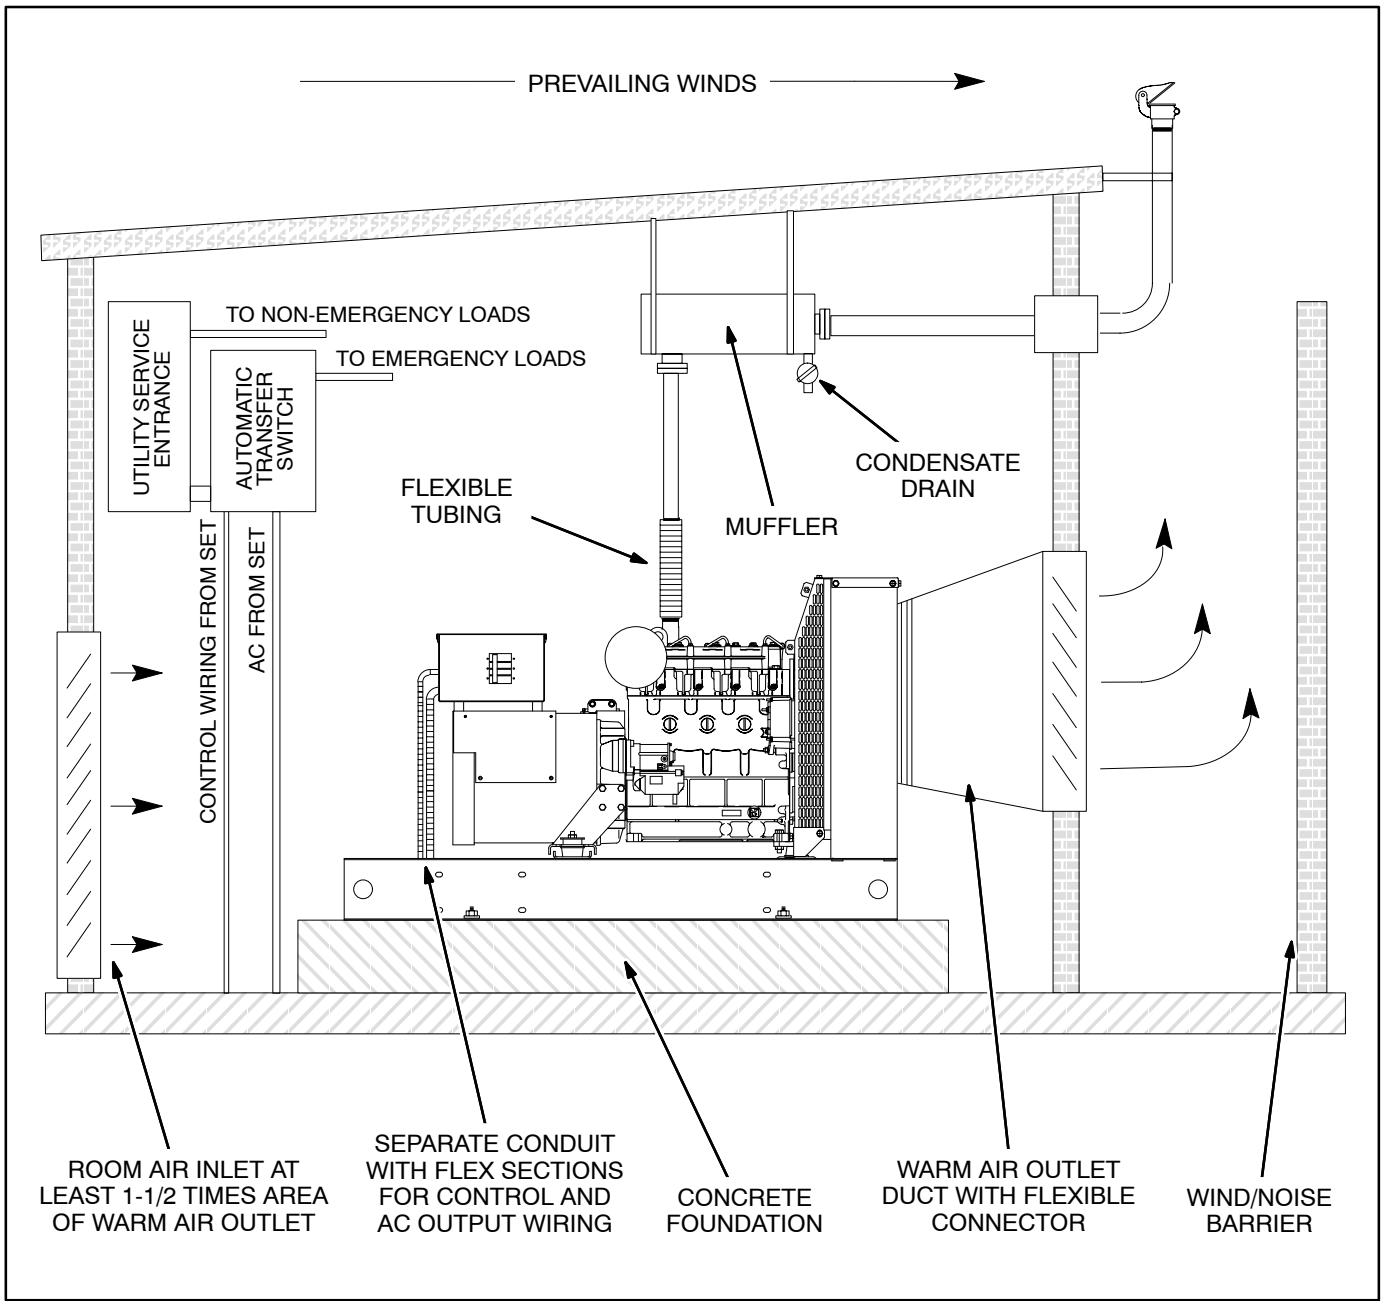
TYPICAL INDOOR EMERGENCY STANDBY INSTALLATION
